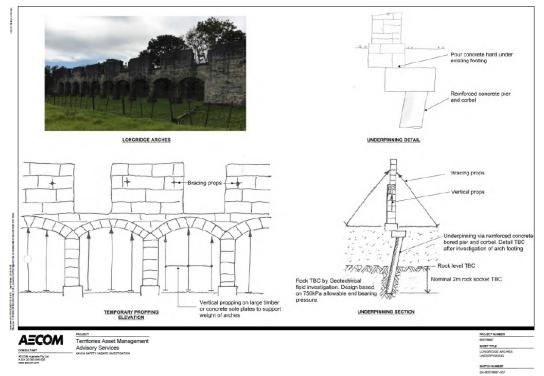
Proposed works for underpinning of arches [Source: AECOM]
